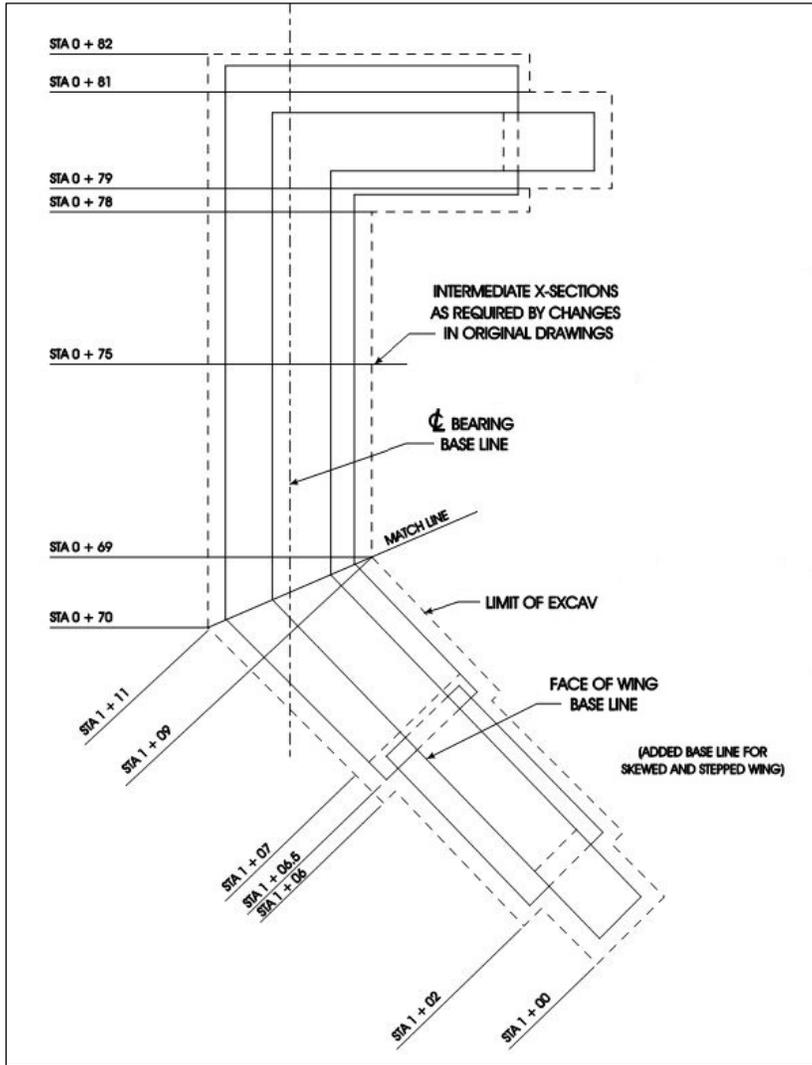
10: Bridge Excavation Survey Using an Additional Baseline
